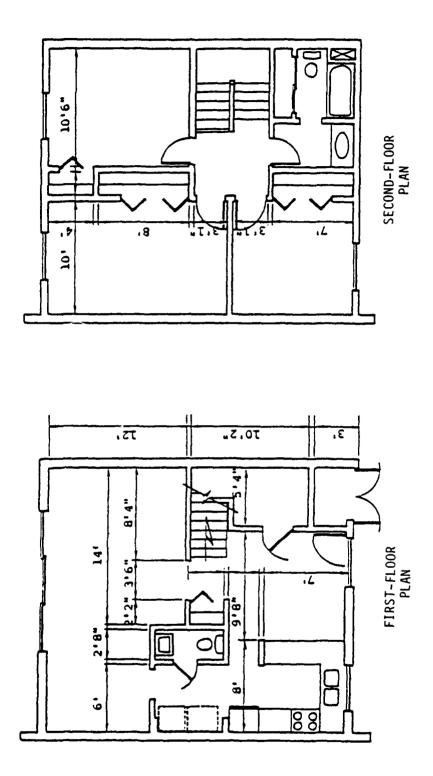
Floor Plan of Typical Three-Bedroom Apartments Measured During this Study.
